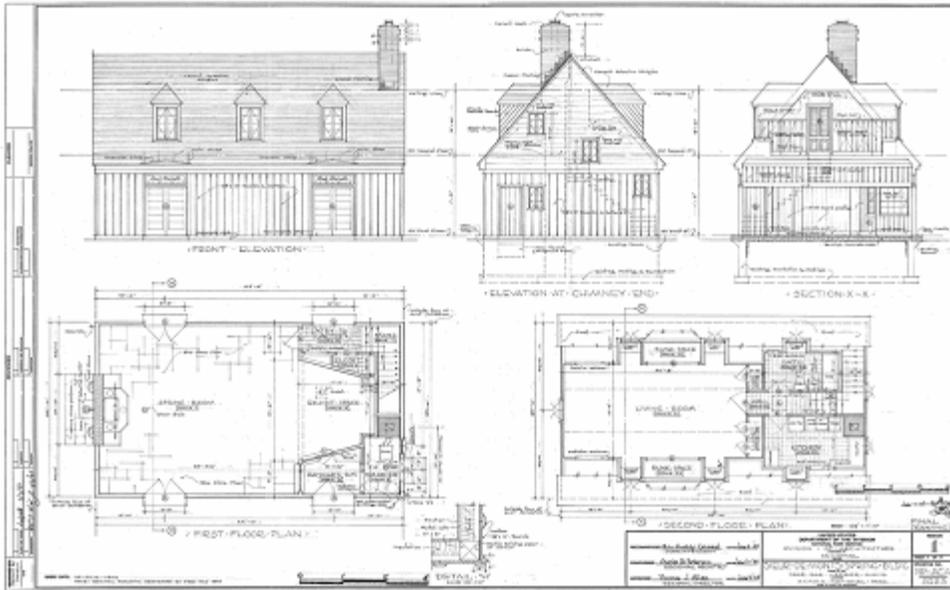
Plan of the spring building (now named Nature Center) 1949, that was rebuilt after the 1947 fire. In this plan, two exterior water fountains are on the building's west elevation. (ACAD_123_2023, Denver Service Center)
